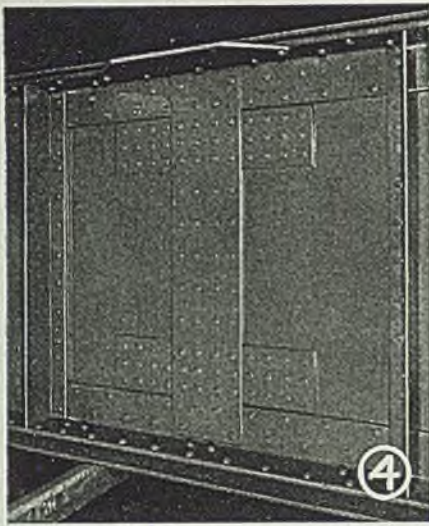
Detail of same girder as in Fig. 2 showing flat and button-head rivets employed. All photos and data courtesy of American Institute of Bolt, Nut, and Rivet Manufacturers
